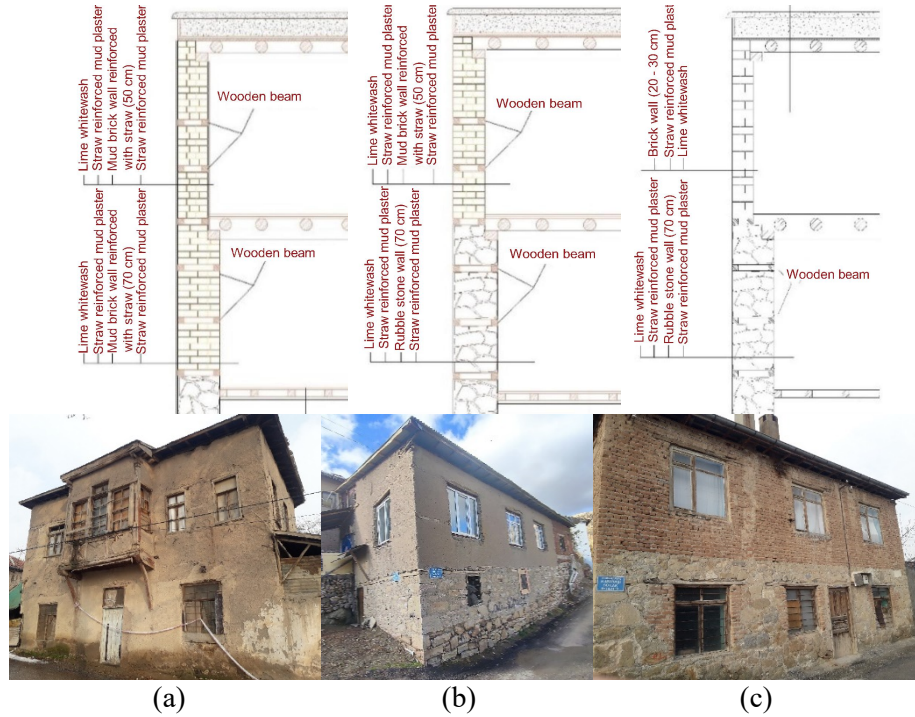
Types of exterior walls in traditional Hüseynik houses (a: mud brick + mud brick; b: stone + mud brick; c: stone + brick)
